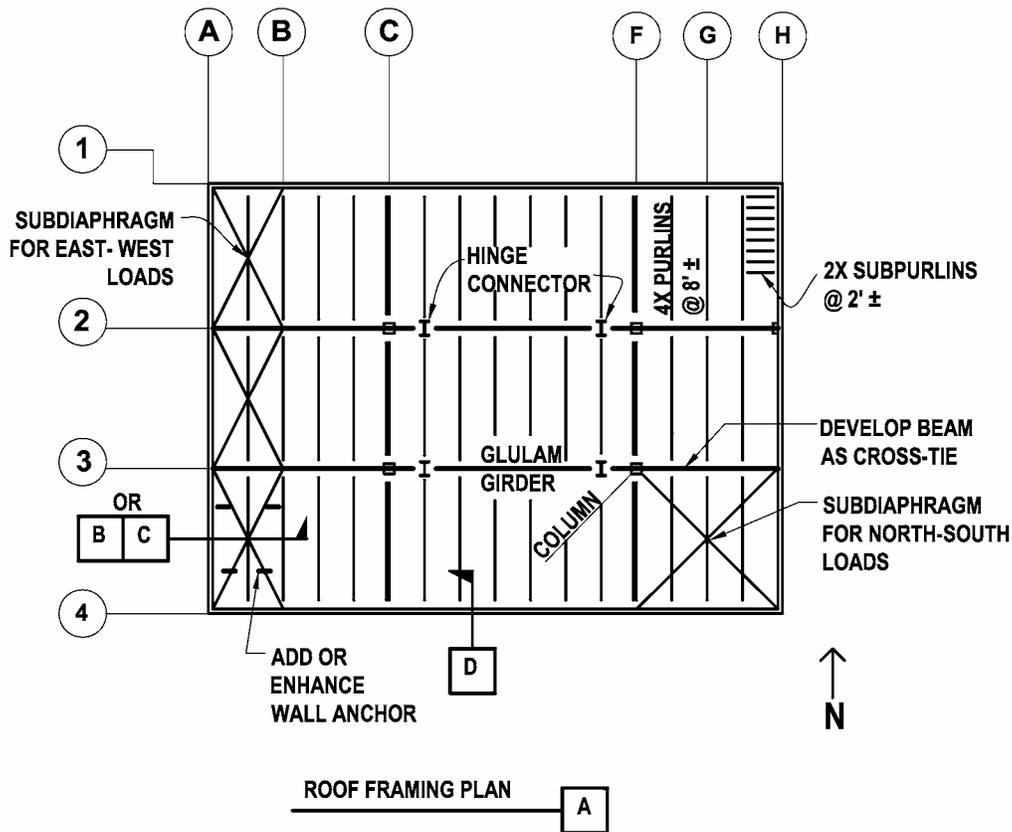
A: Roof Plan with Wall Out-of-Plane Anchorage for Flexible Wood Diaphragm
